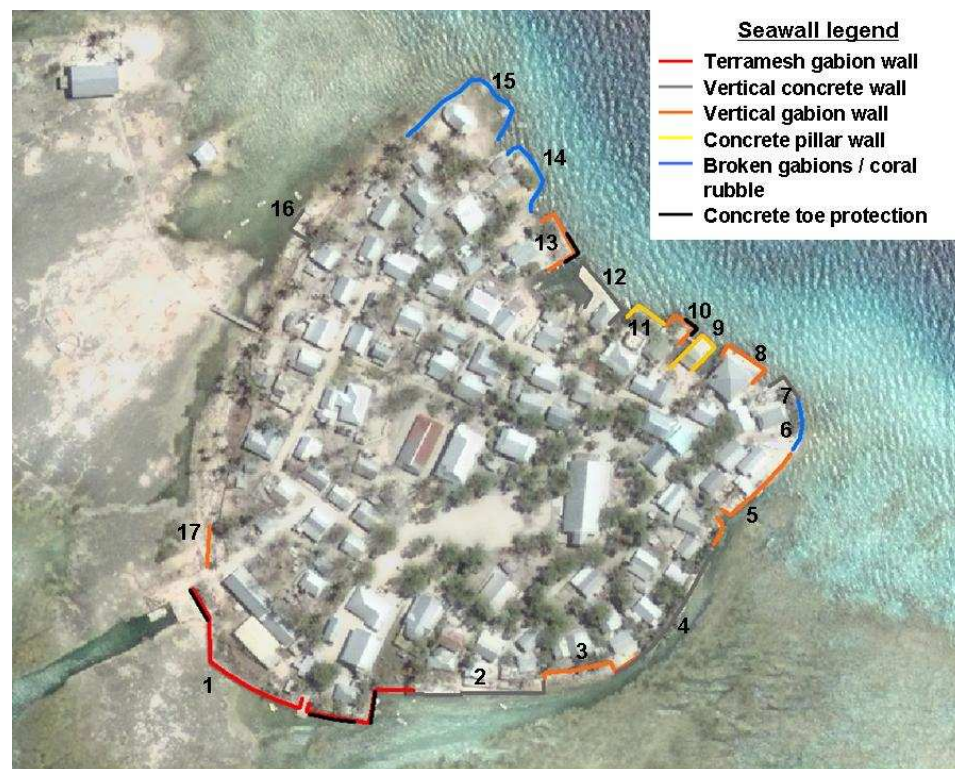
Summary of the location and type of seawalls constructed around Fale.
